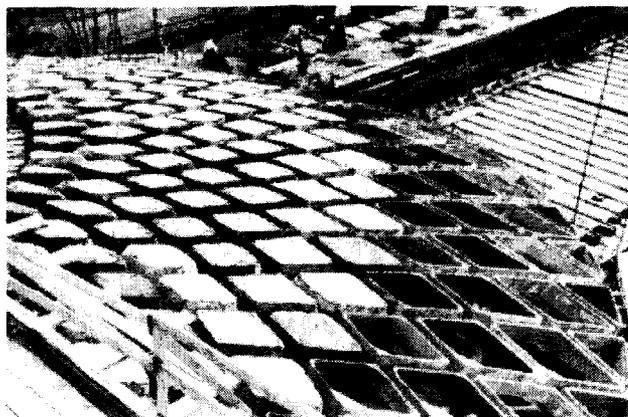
Constructional system used on the lamella dome projects. Pans of ferro-cemento form a permanent formwork for the poured concrete dome.
